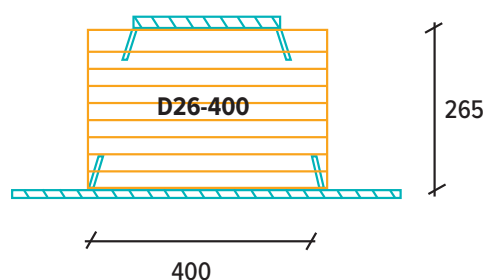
DELTABEAM® PROFILE DIMENSION EXAMPLES
